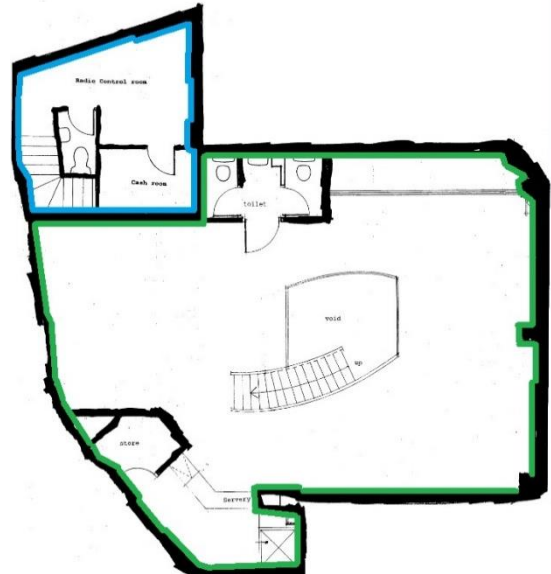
(above): Historic plan of the upper floor of the building, with the small unit edged in blue and the restaurant in green.
